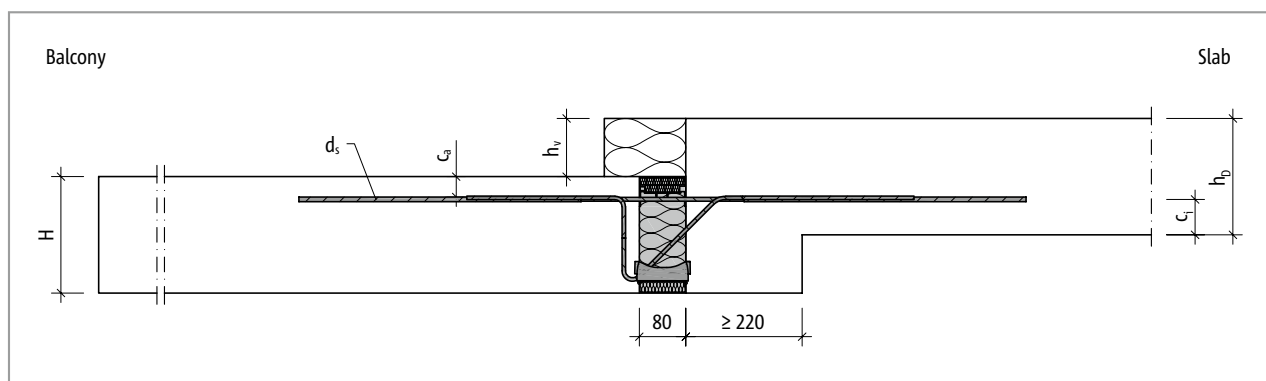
Schöck Isokorb® T type K: Smaller height offset downwards (balcony lying lower)
